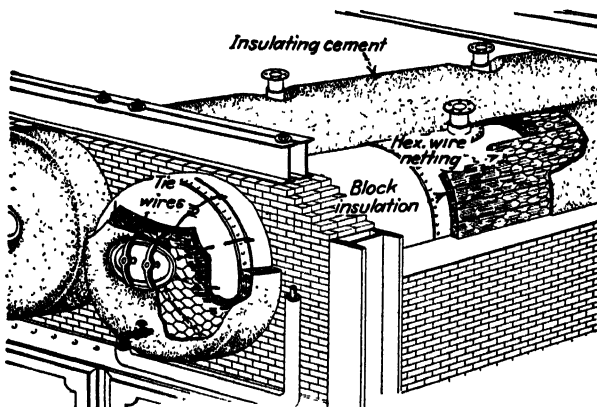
Method of insulating drums and drum heads. (Courtesy of the Johns-Manville Co.)
